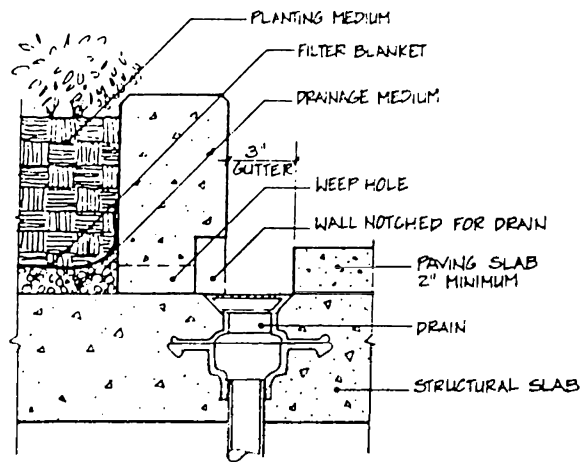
Weep Holes and Gutter to Roof Drain. Where a waterproof roof is not necessary, paving slab is poured directly onto the structural slab. Planting medium behind wall is drained through weep holes to an open gutter.
